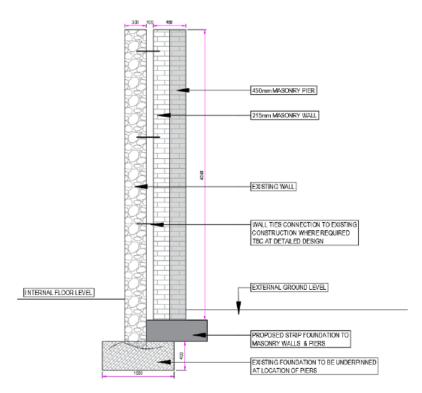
Section of the proposed masonry wall creating a new façade onto CGDP.
